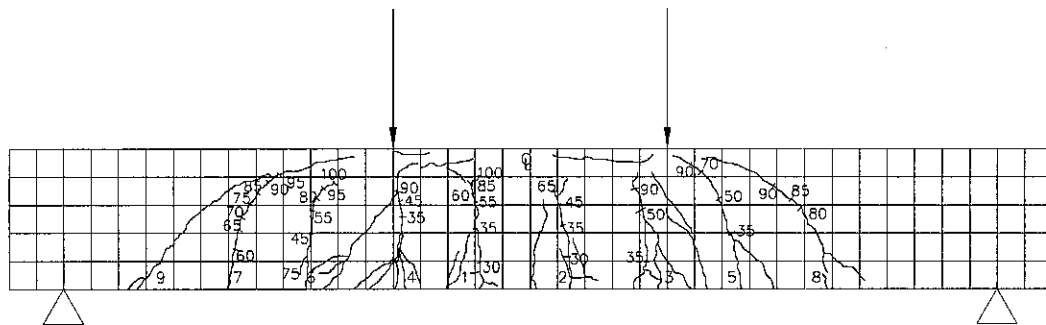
18. Crack pattern of FASCC beam specimen (flexural failure)
